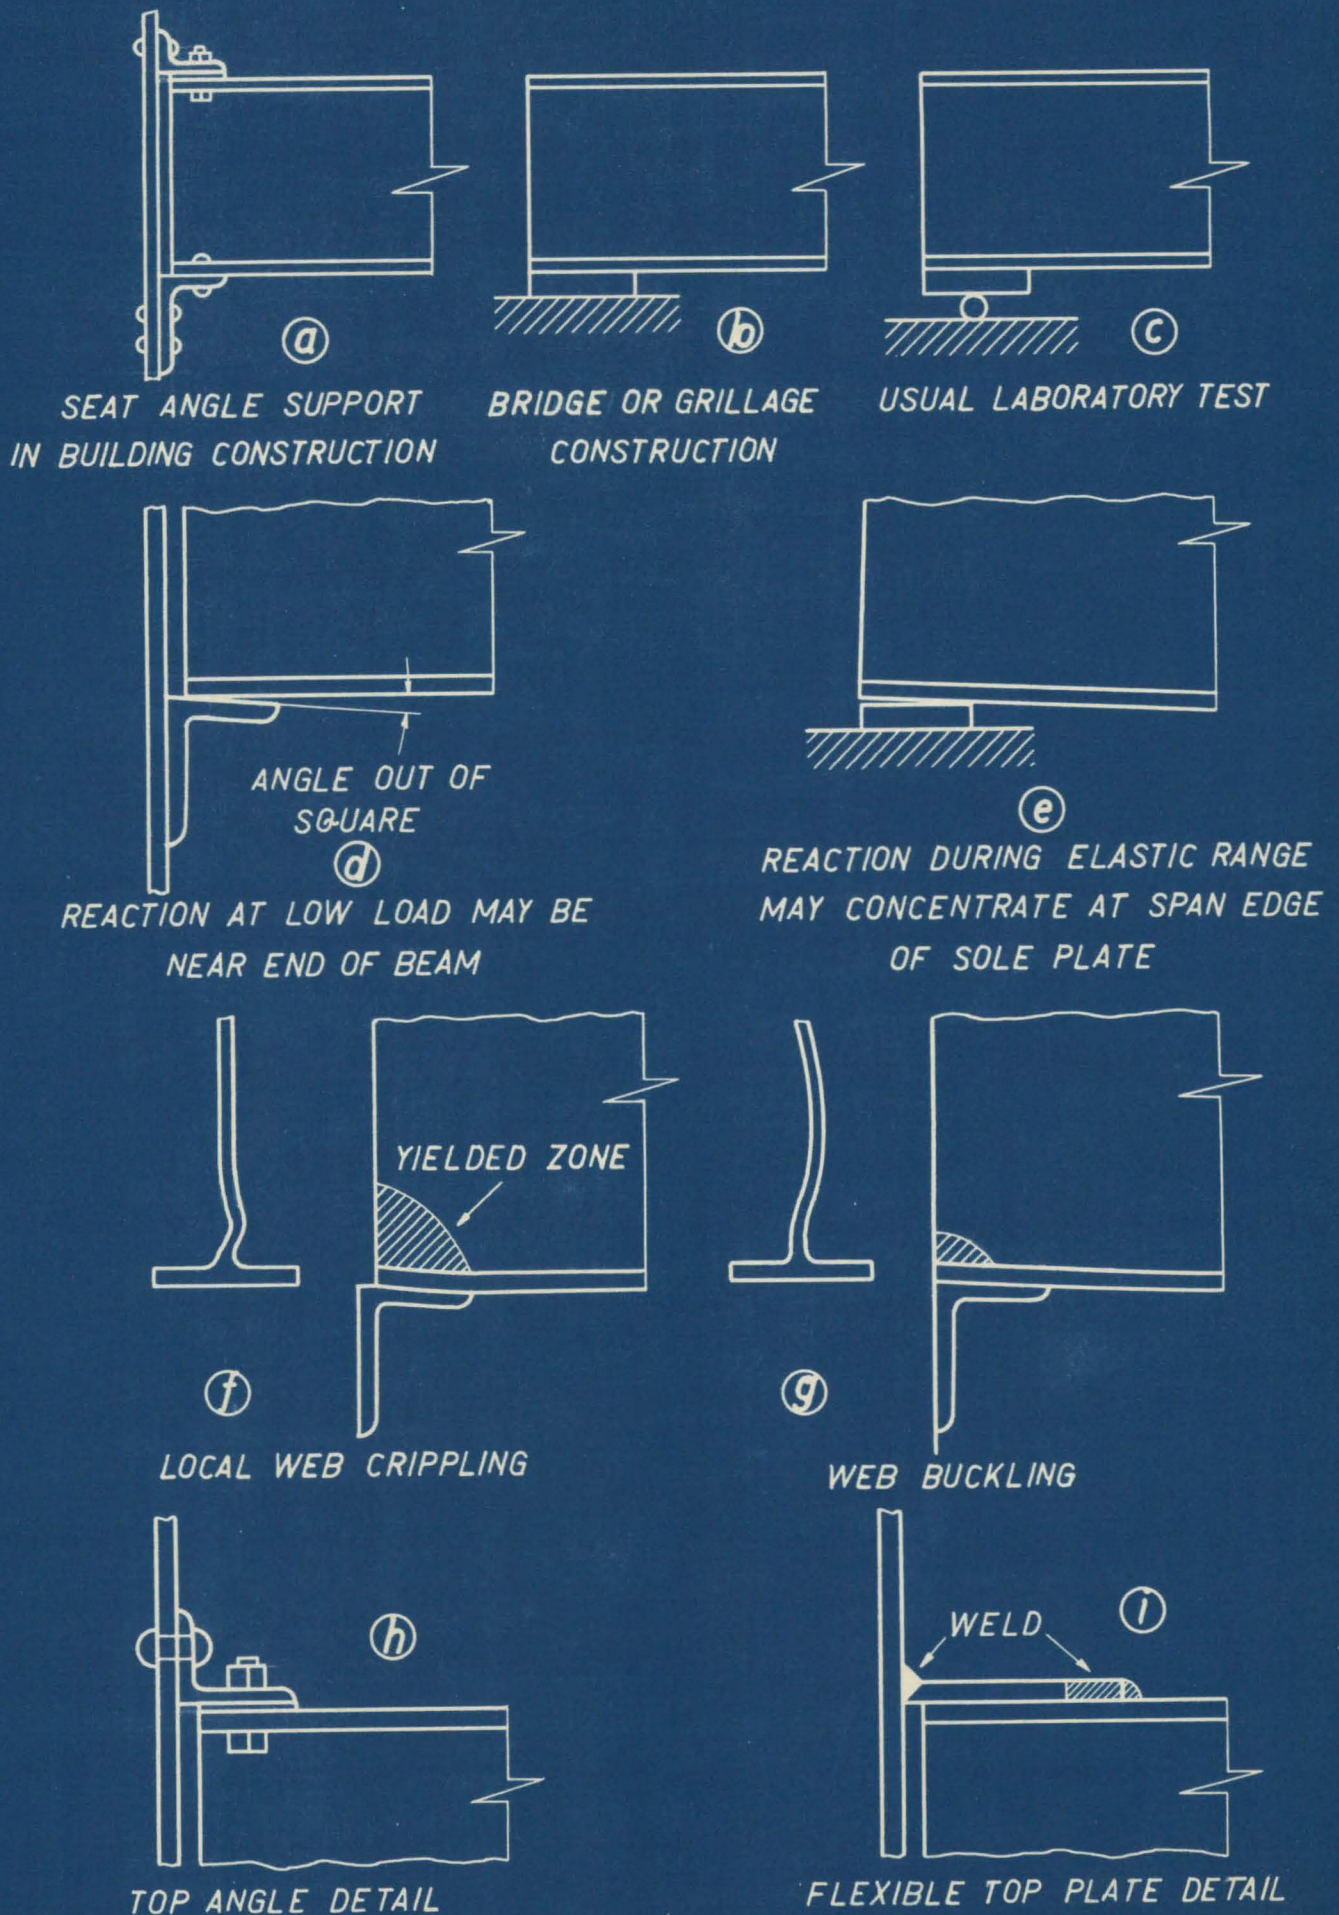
GENERAL BEHAVIOR AT END OF BEAMS
